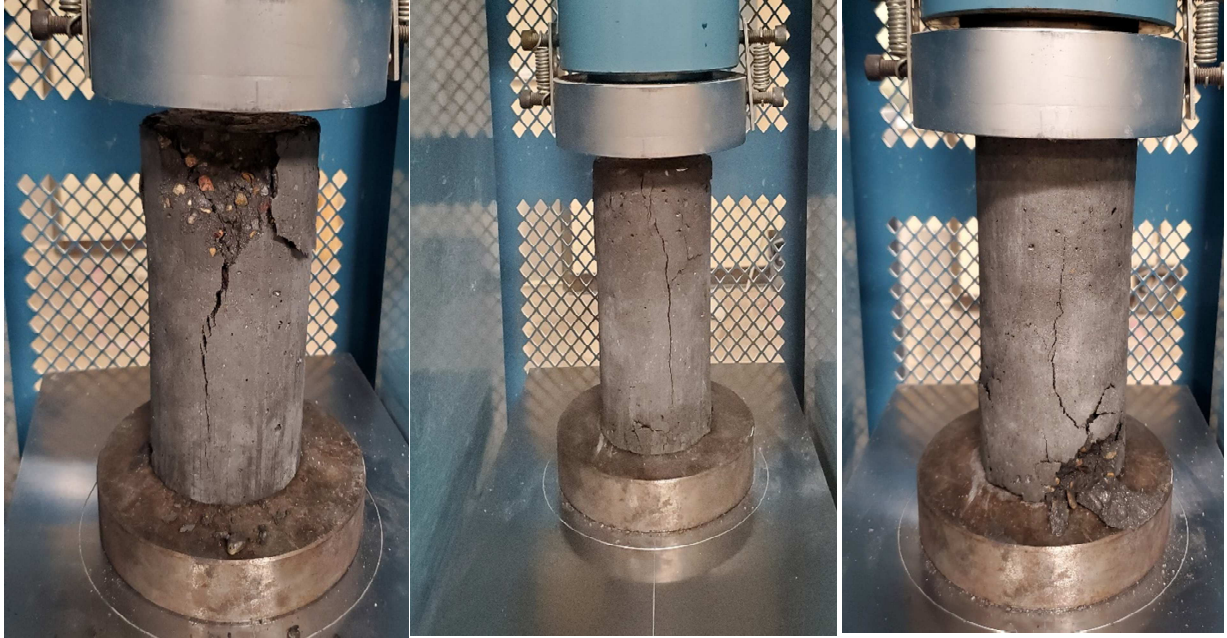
Failure of specimens 10T1, 10T2, and 10T3 under lateral loading.
